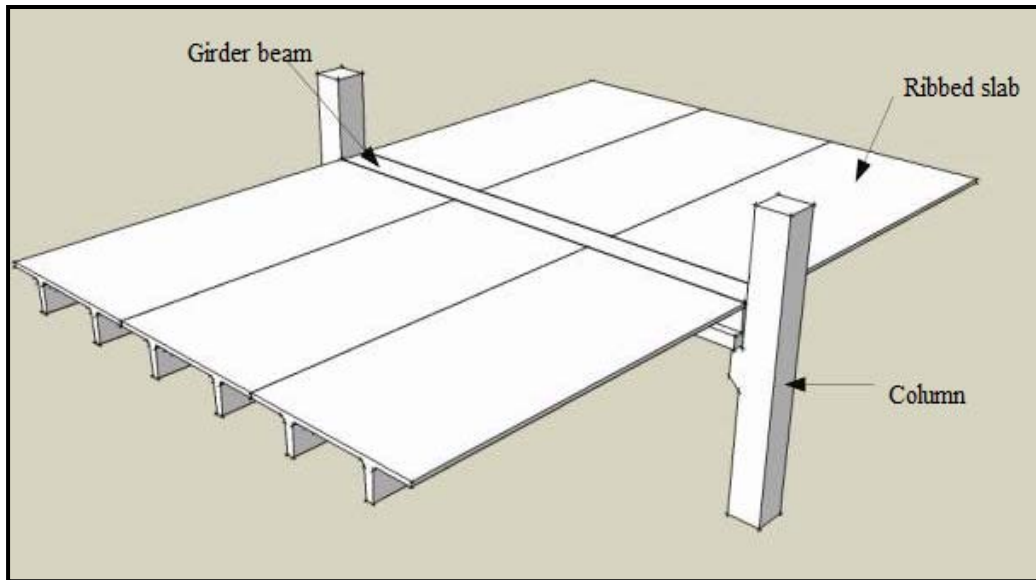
Connection of the ribbed slab to girder beam and girder beam to column. [Courtesy of conceptual design for a pre-cast concrete hotel in Iraq]
